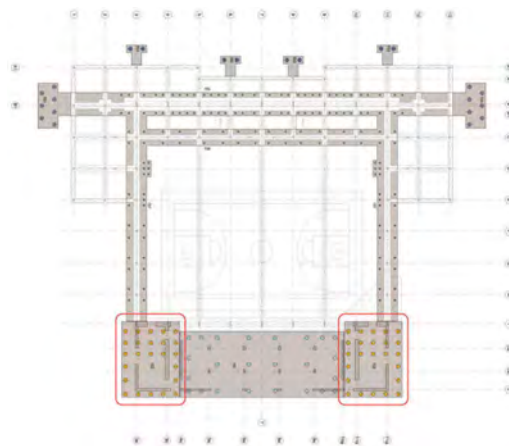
Foundation plan of the sport hall. In red the two seismic cores are highlighted.
